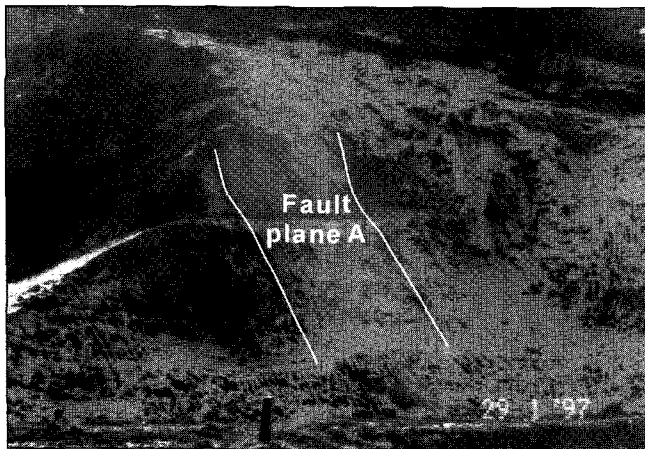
The fault plane of Fault A in Figure 1, as revealed by excavation work for the construction of the foundation of Pier 5.
